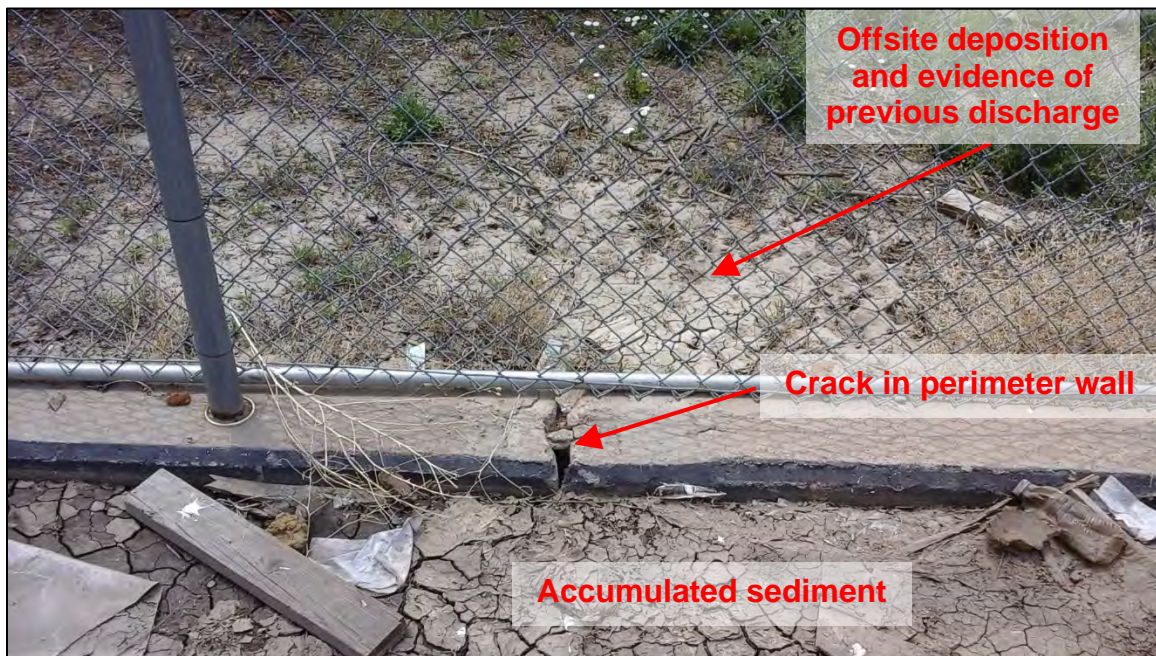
Additional view of accumulated sediment along the south perimeter wall shown in Photograph 26. Note the depth of sediment varied along this perimeter wall.
